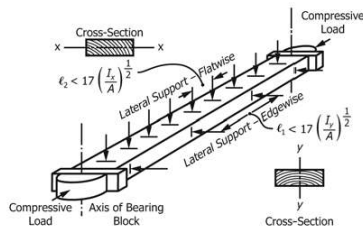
Minimum Spacing of Lateral Supports of Long Compression Specimens
